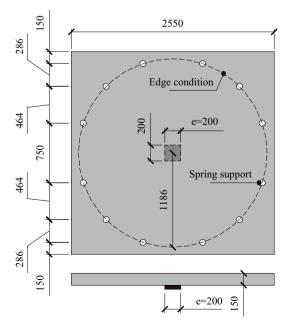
Geometry of the slab prototype (dimensions in mm) [18].
